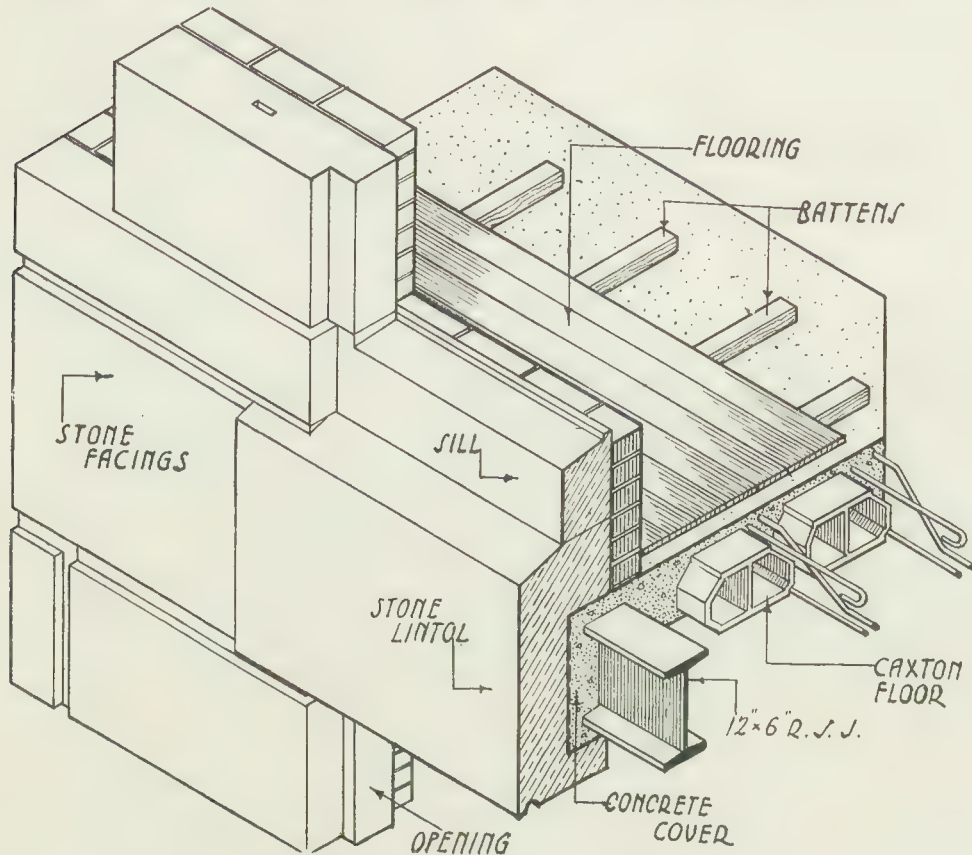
CONSTRUCTION OF "CAXTON" HOLLOW BLOCK FLOOR
